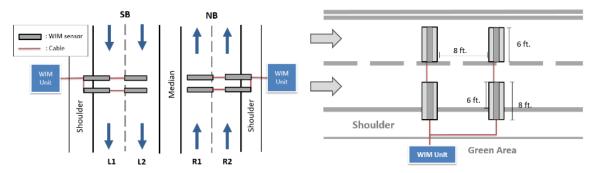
Portable WIM Installation Schematic Plan for Outside and Inside Lanes.
